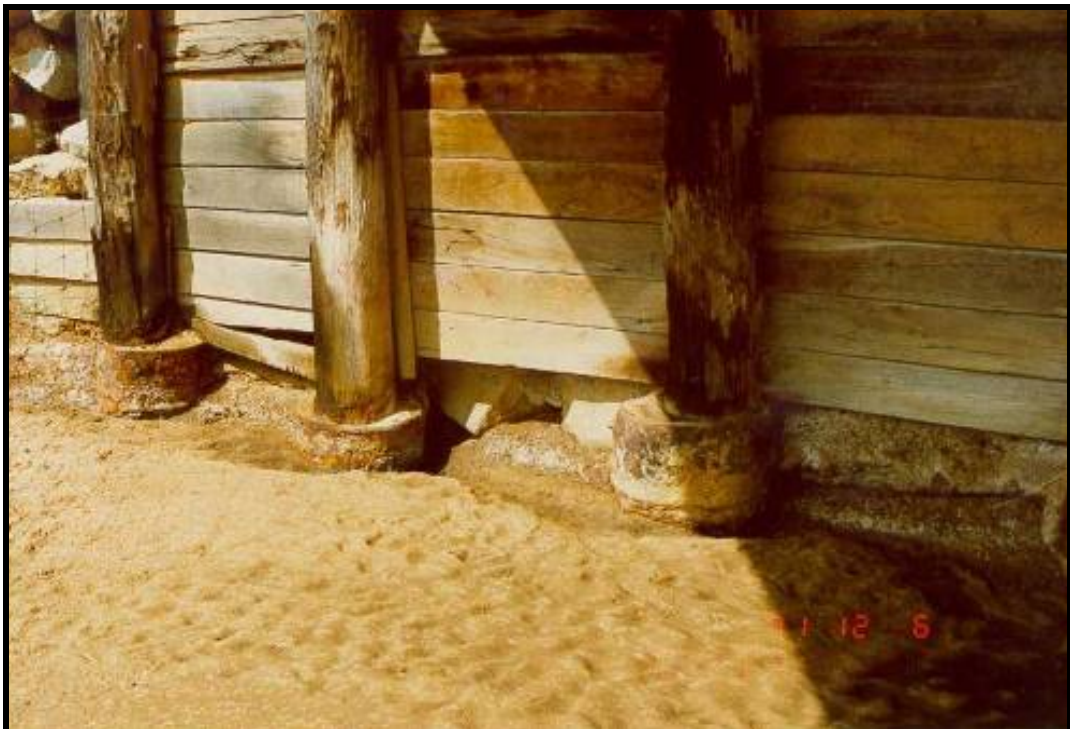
UNDERMINING OF ABUTMENT SHEETING BY SCOUR
